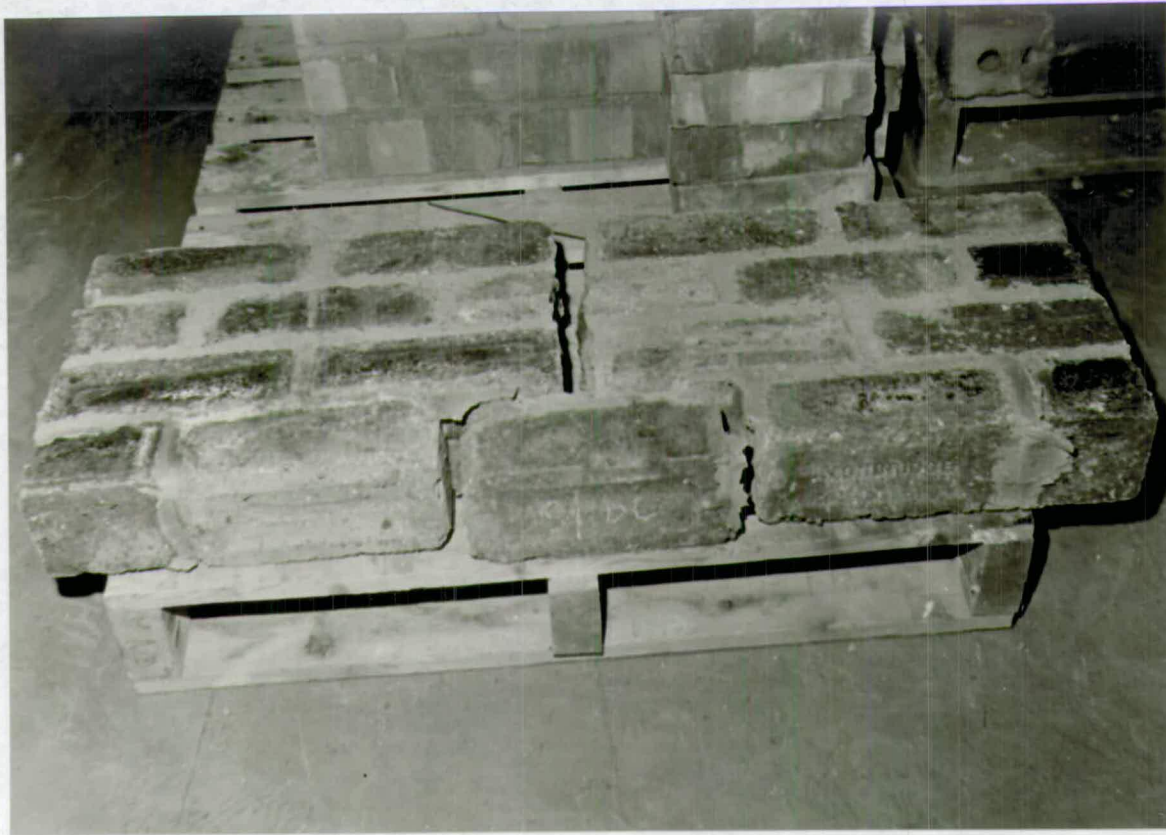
COMBINATION OF BOND FAILURE AND SPLITTING OF BRICKS OF A WALLETTE
